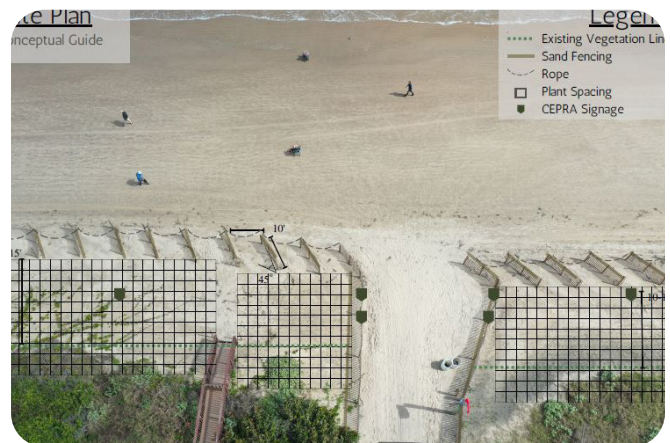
Conceptual Site Plan for Dune planting at South Padre Island
